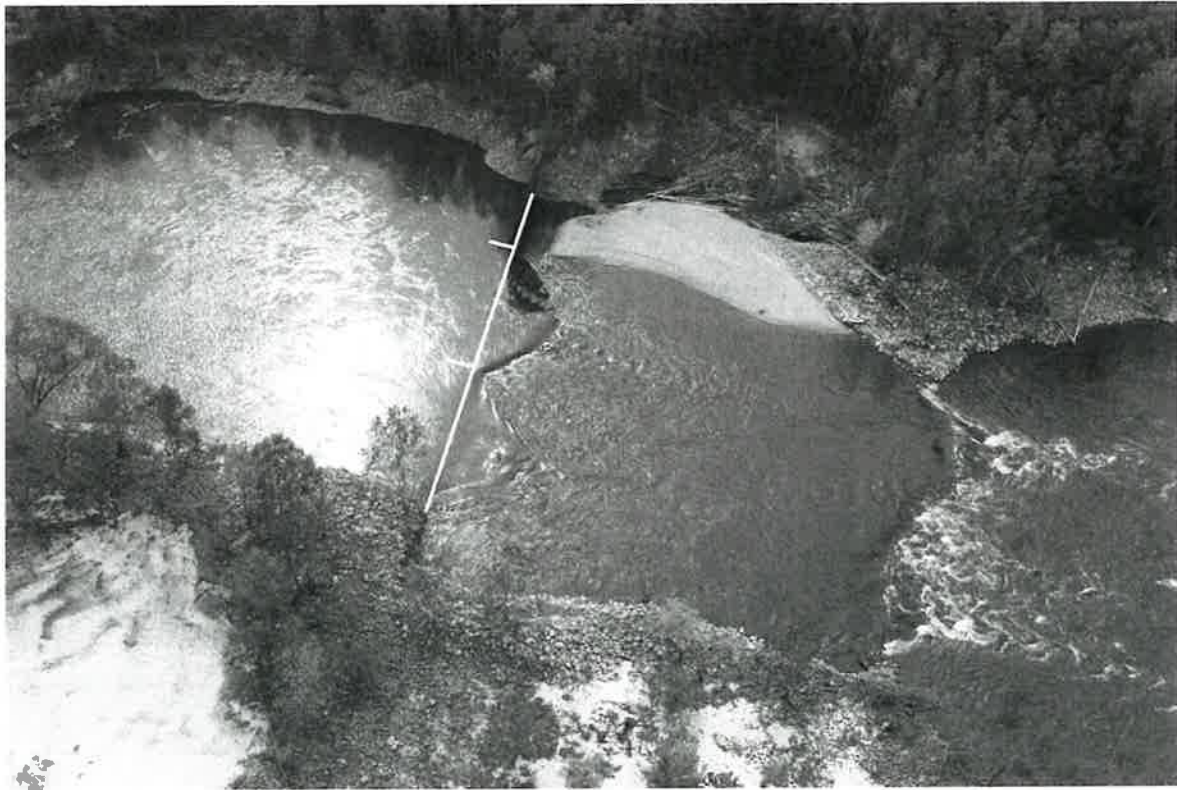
This photo depicts an approximate original center line of the weir. The straight flow across the north portion would suggest that portion of the sheet wall is mostly intact and near the center line. The project as proposed would also be to straighten the central portion back to original design and drive pilings behind it. The central section appears to be the primary area of the weir that has bent over and portions of the wall can be seen just below the water surface in. The central section is primarily the southern portion of the V-notch design that was sloped 3:1. The sections of the weir outside of the low bank would also be bolstered by driving pilings, which would make up the total 300' of the project. The photo also depicts existing navigation obstacles downstream of the weir with shallow flow over rip rap during low flow conditions. No work is being proposed in the downstream area under this project.
